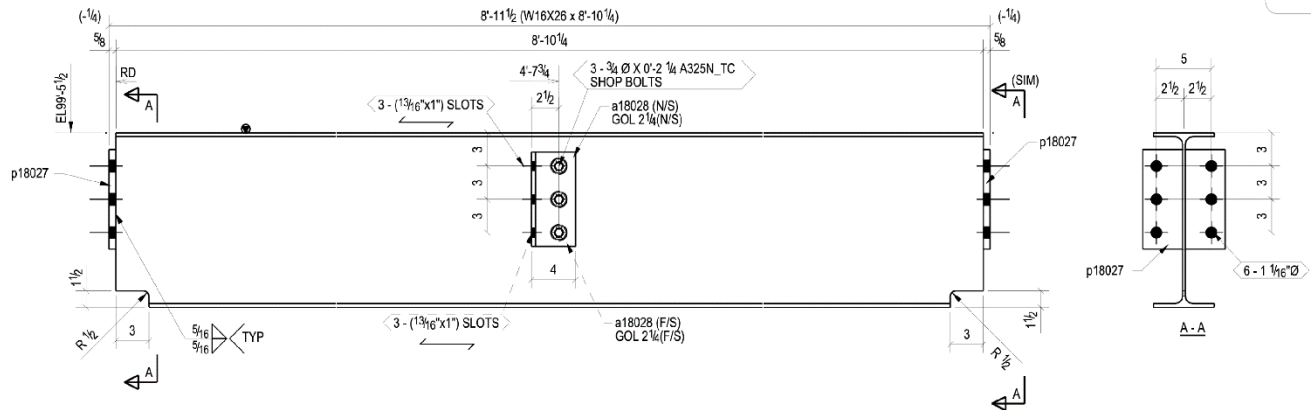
End Plate Connections – Not Friendly to Tolerances
